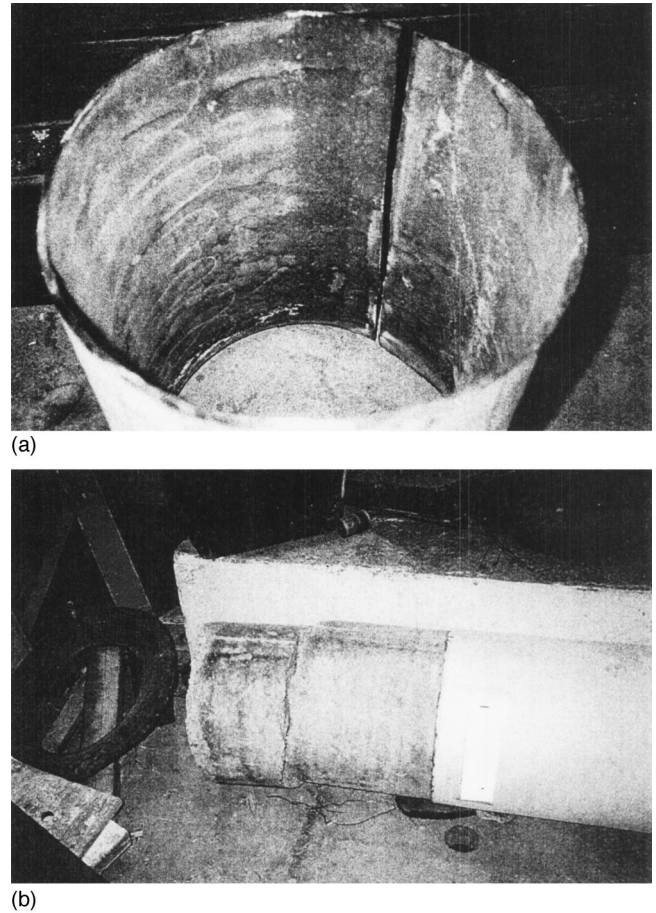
(a) Steel section after removal from column; (b) column and concrete after removal of steel section
